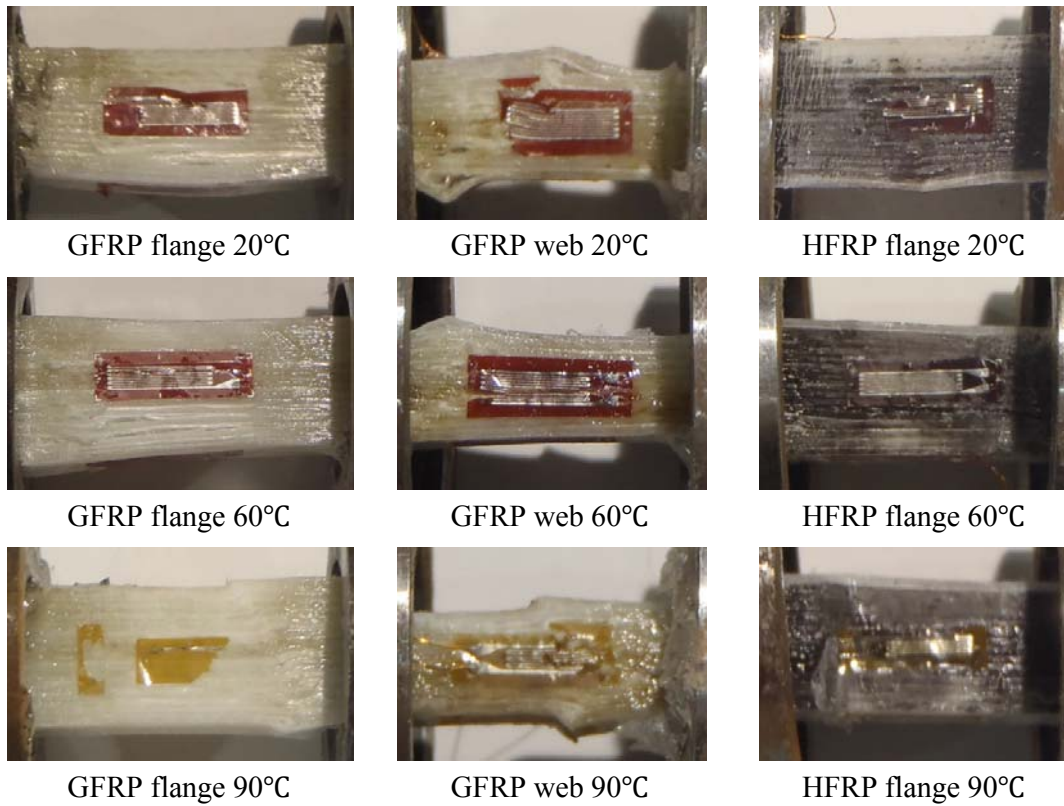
Compression failure patterns of GFRP/HFRP flange and GFRP web coupons
